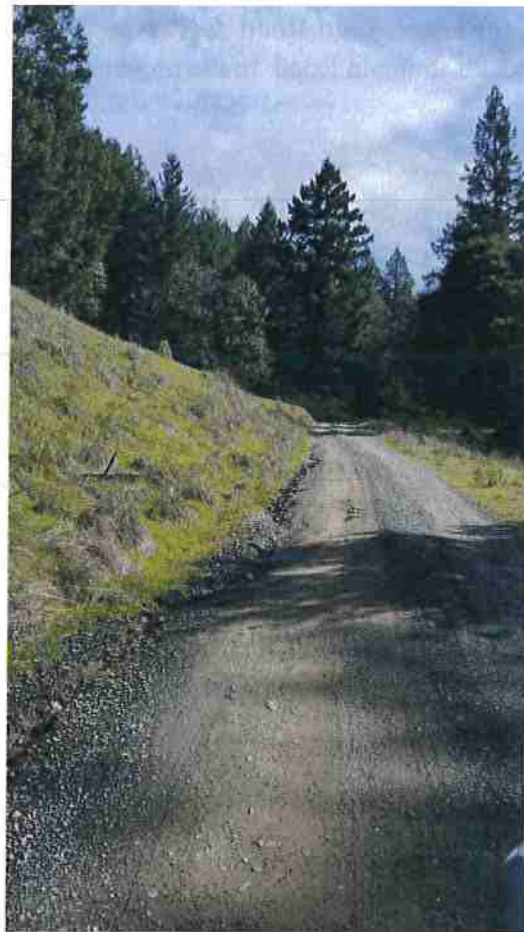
Photograph showing a section of roadway that needs the inside ditch to be regraded and a rolling dip or drainage relief culvert is needs to be installed located at RP53.
